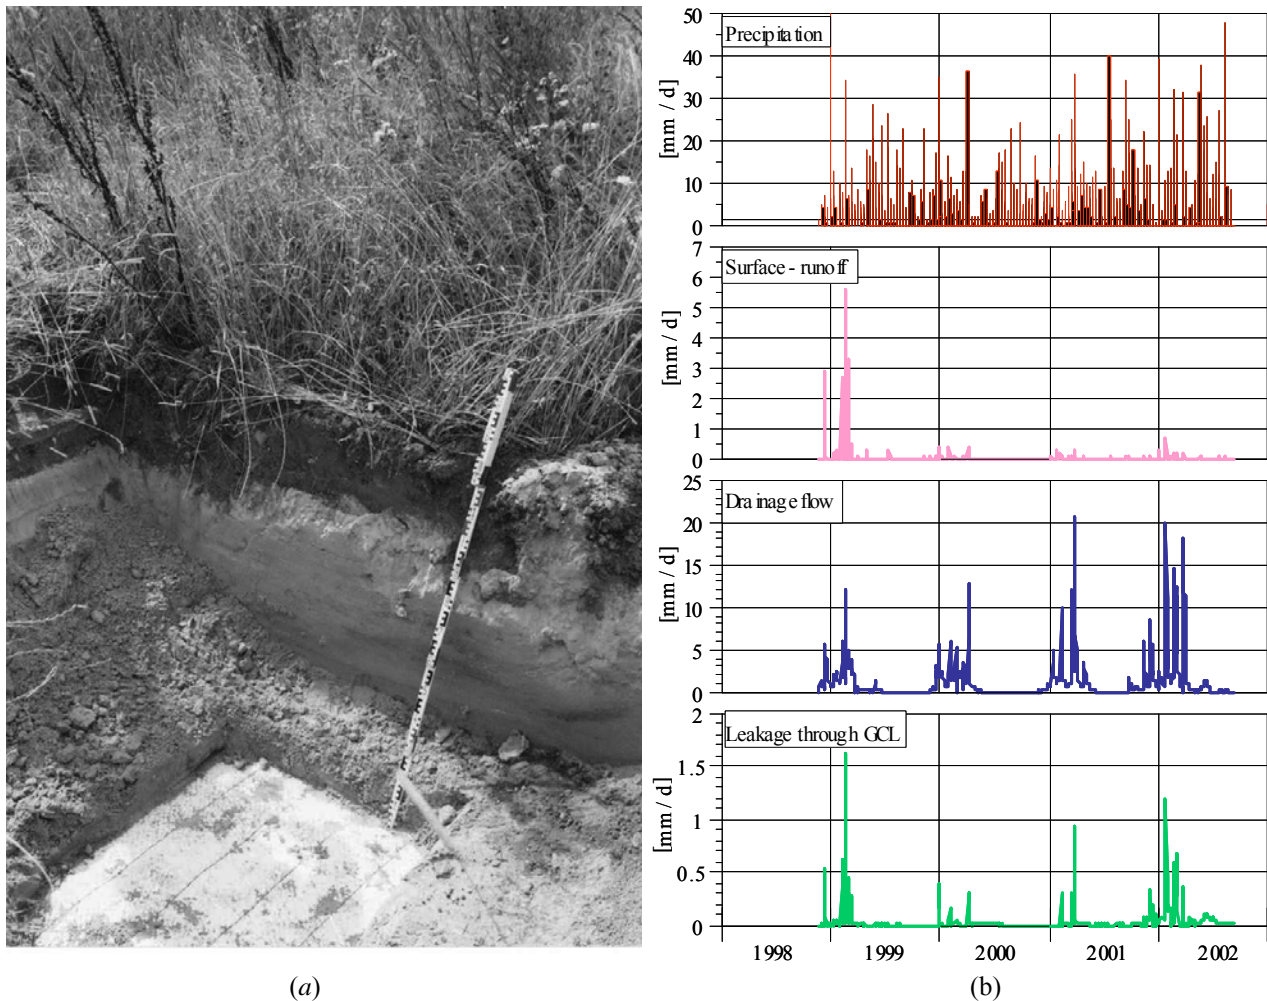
(a) Test-pit showing a section of the test field with vegetation, top soil (dark), subsoil (light grey) and drainage geocomposite (white); and (b) Results of test field measurements: daily values of precipitation, surface runoff, drainage flow and leakage through GCL from 1998 to 2002 (from Henken-Mellies & Zanzinger 2004).
